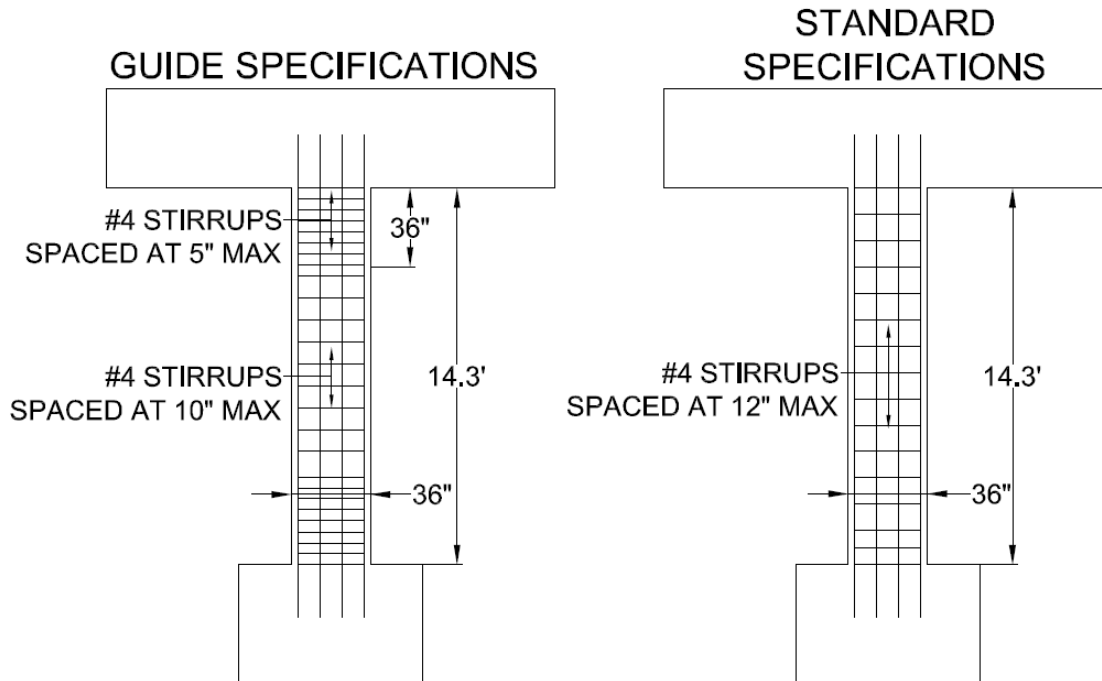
Stave Creek Bridge Bent 3 Final Design Details (SDC A2)
